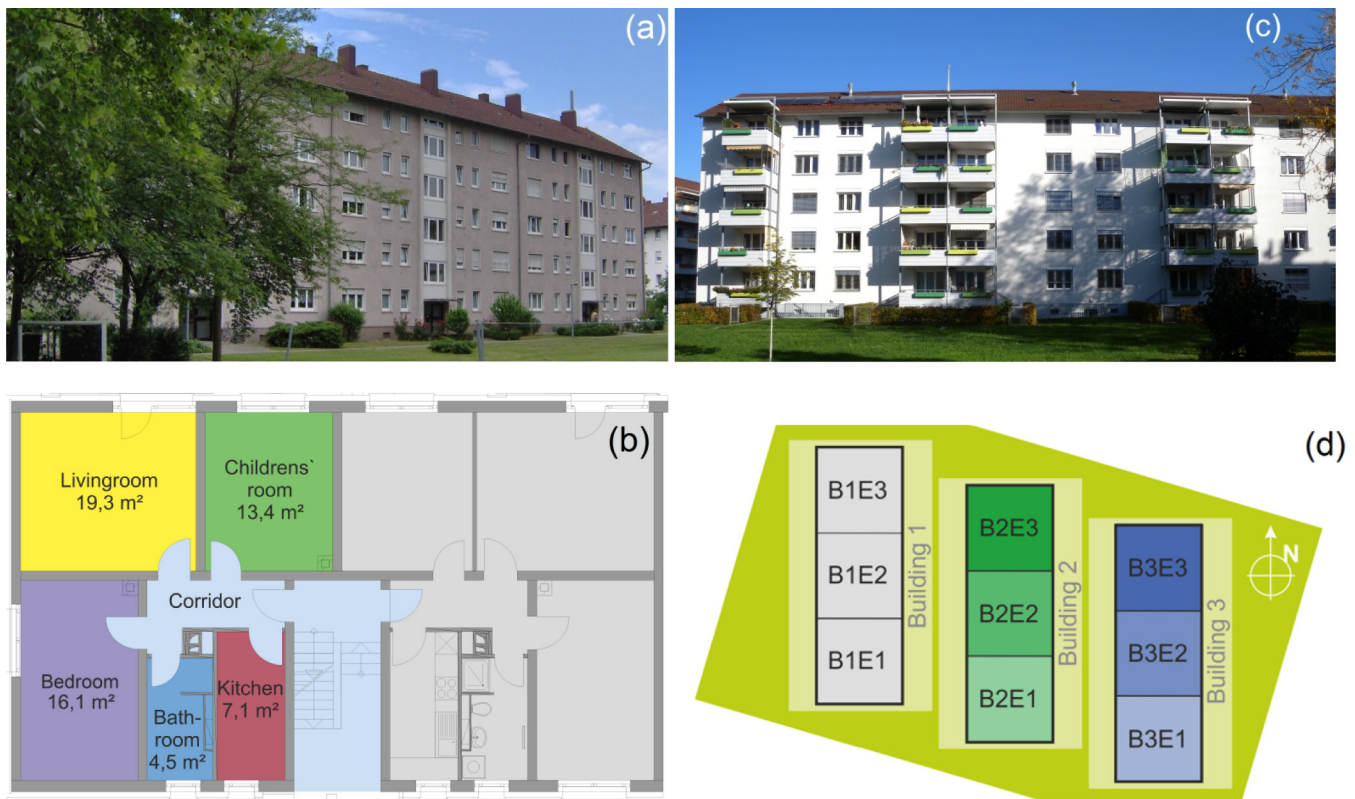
One building façade before retrofit (a), one back façade after the retrofit (c), floor space of the apartments, for one entrance with south-gable (b), relative position and orientation of the buildings (d).
